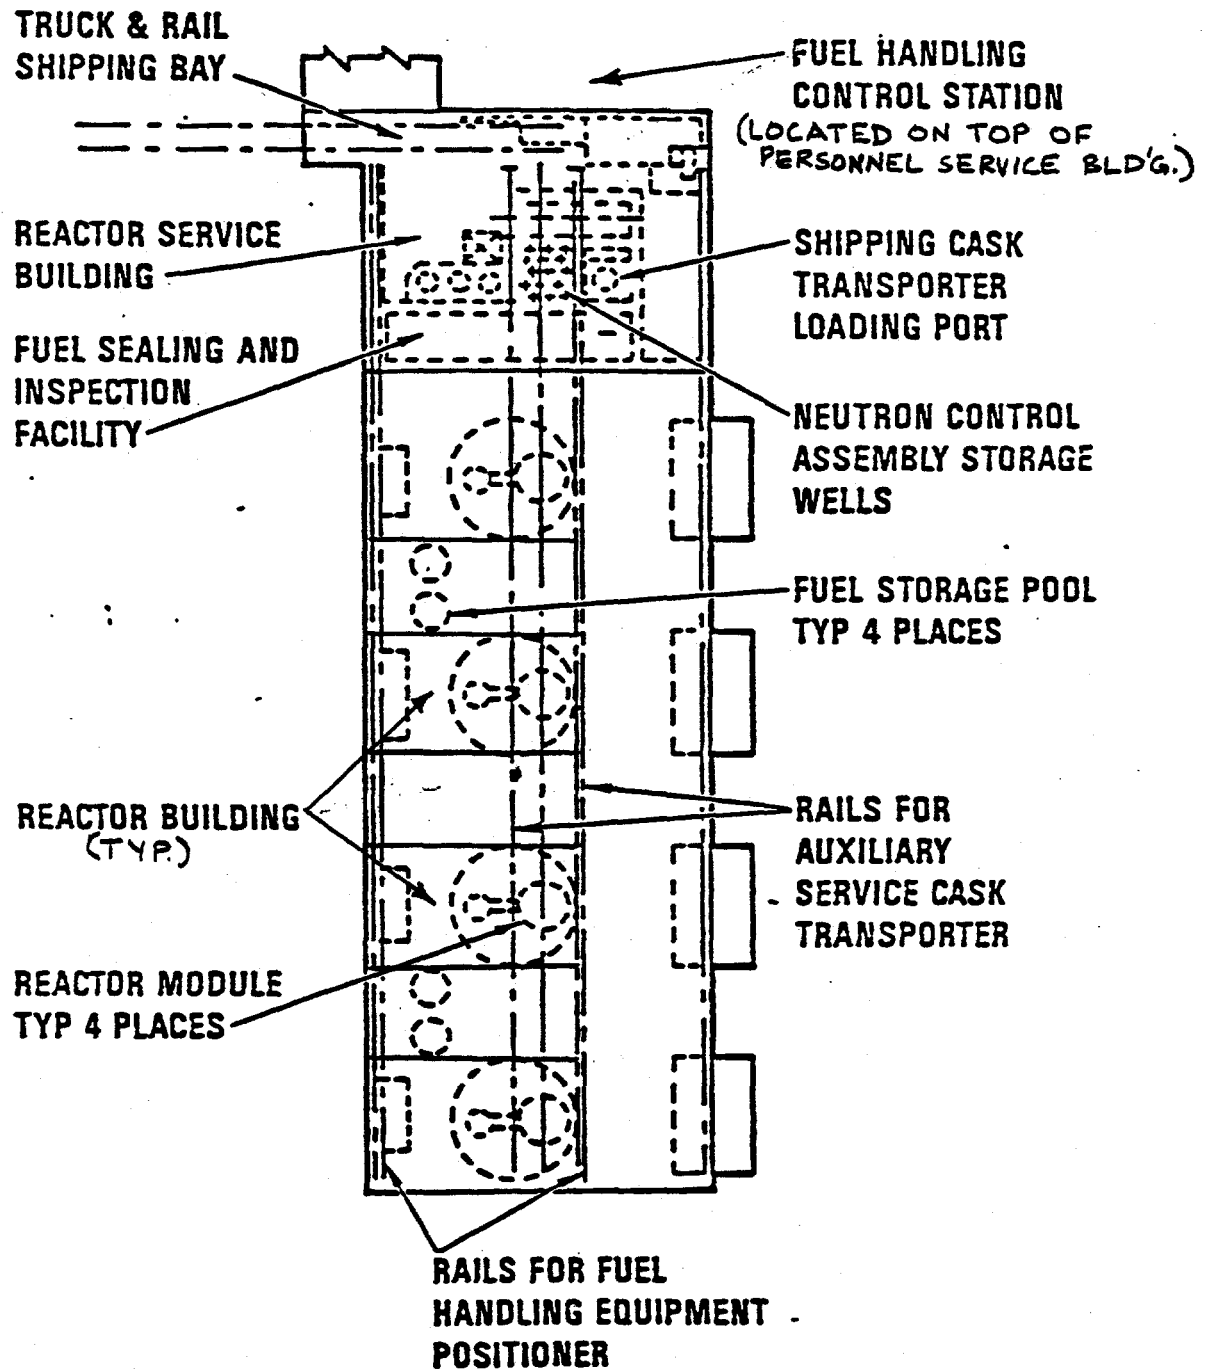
SITE FUEL HANDLING — GENERAL ARRANGEMENT
